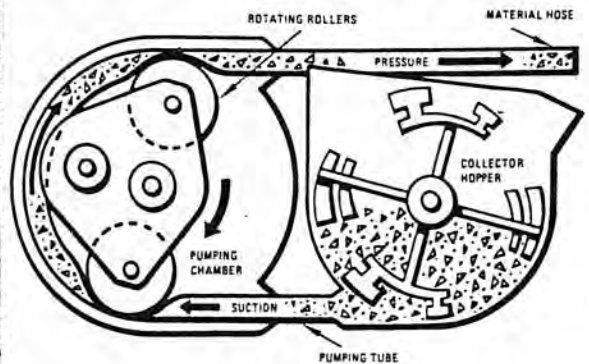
Operating principle of squeeze-concrete pump (after Littlejohn, 1980).
